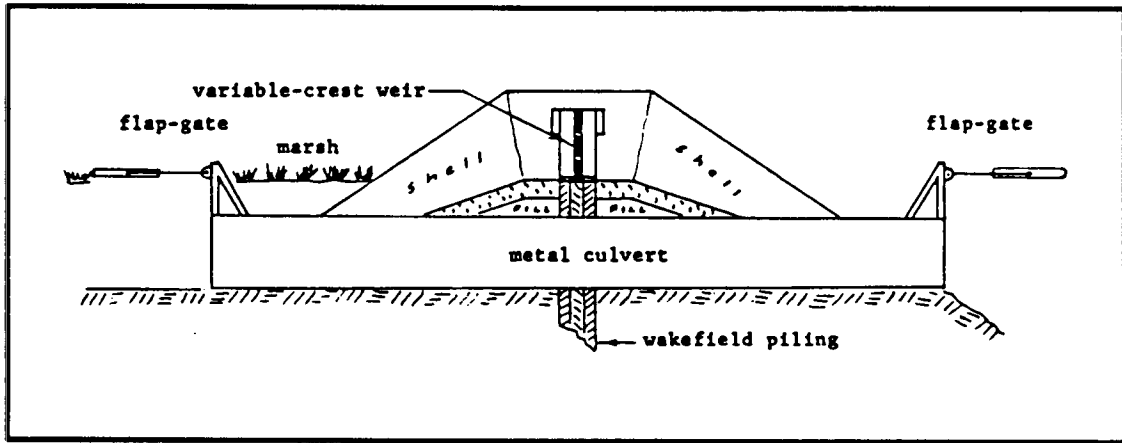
Double flap-gated culvert with variable-crest weir (adapted from Broussard 1988). NOTE: conceptual drawing; not to be used for design.
